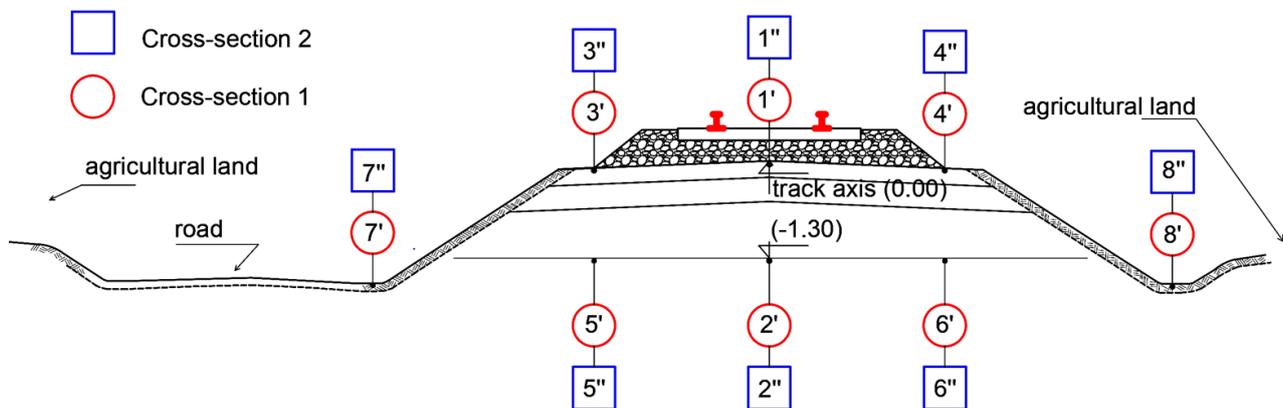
Typical cross-section of the railway and locations from where samples were collected
